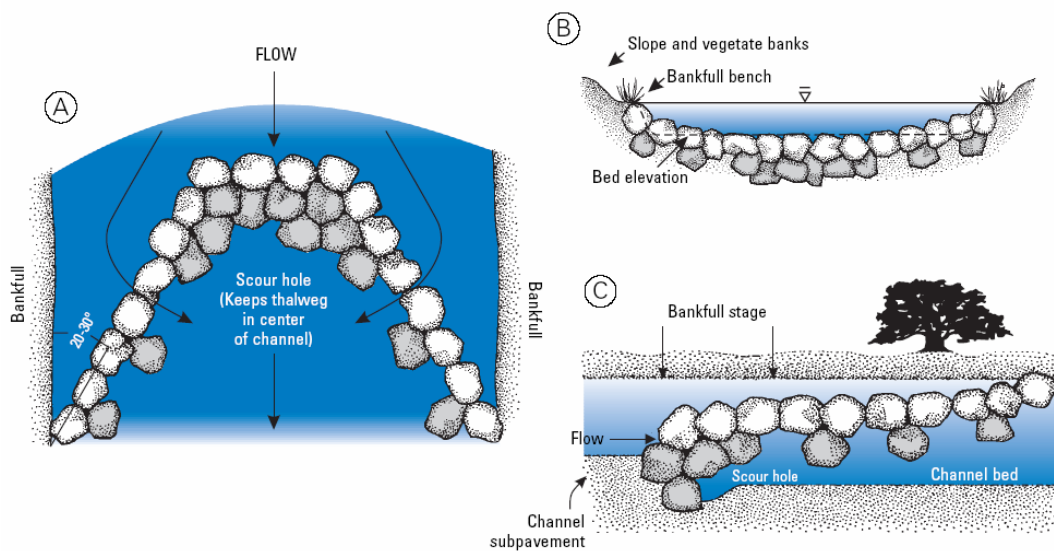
(a) Plan view, (b) Cross-section, and (c) Profile views of cross vane
